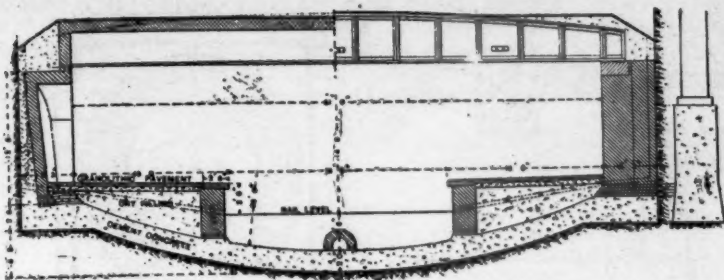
TRANSVERSE SECTION OF COVERED WAY FOR CENTRAL STATION, TROGATE SECTION
